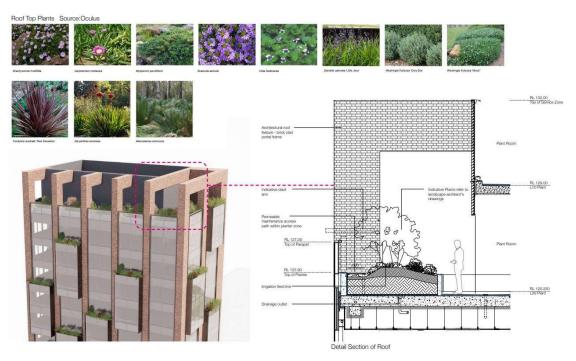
Roof planting detail (DRP No. 9) (19 March 2021)
